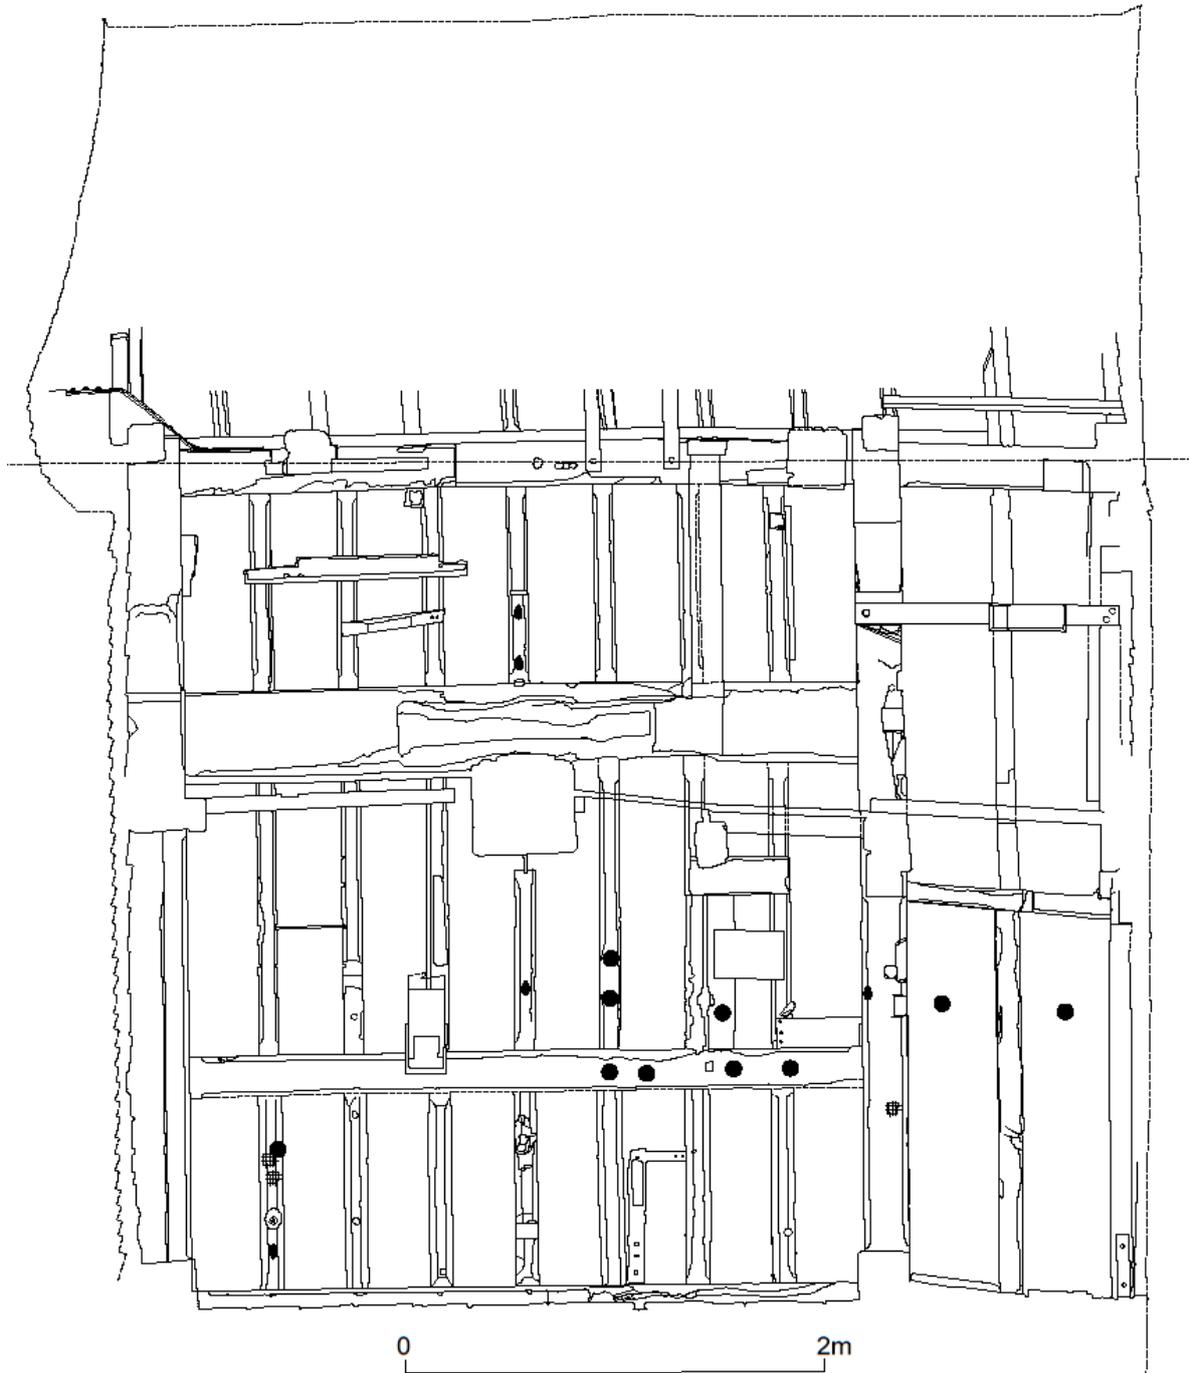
First and second floor, south elevation, showing location of the apotropaic marks
